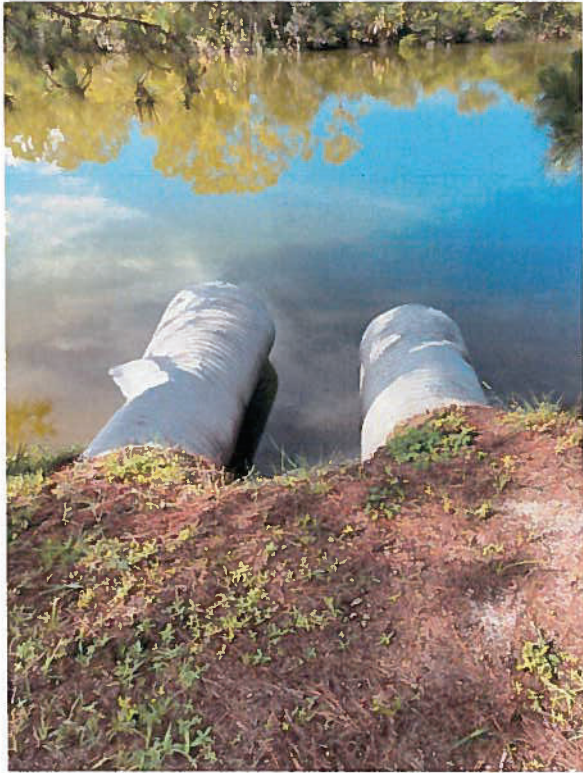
Overflow Culverts from Stormwater Tract to North Canal
